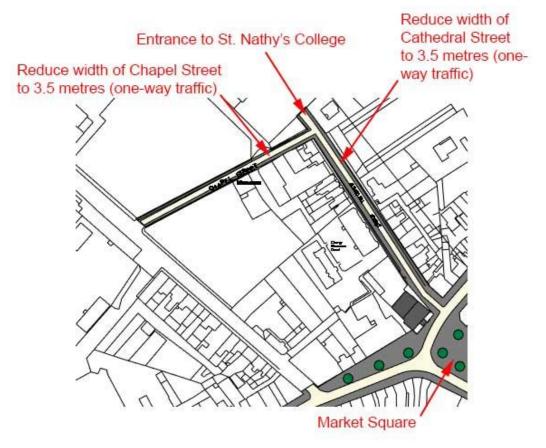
Proposed public realm works to Cathedral Street and Chapel Street
